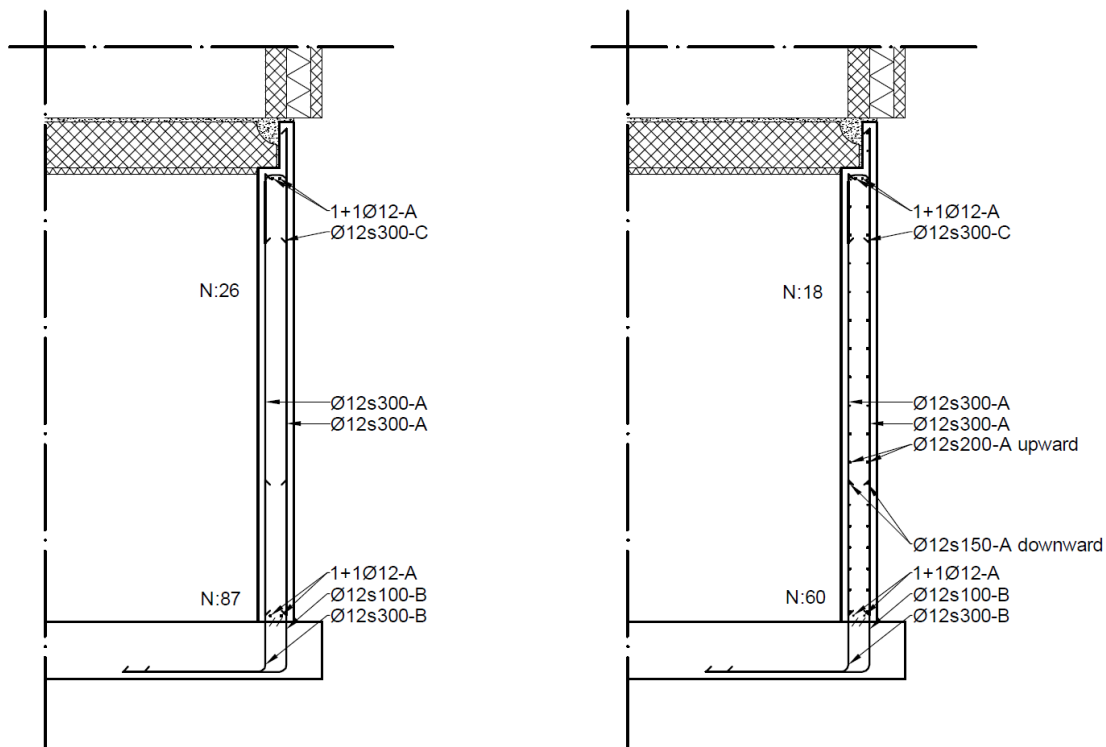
Wall reinforcement with regard to requirements in ULS (left) and SLS (right)
